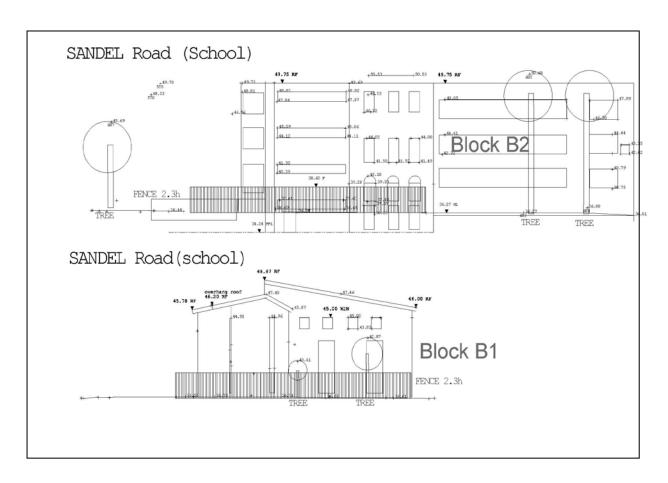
2D Elevations EXISTING Girls School (Sandal Road) Block 1 & 2
